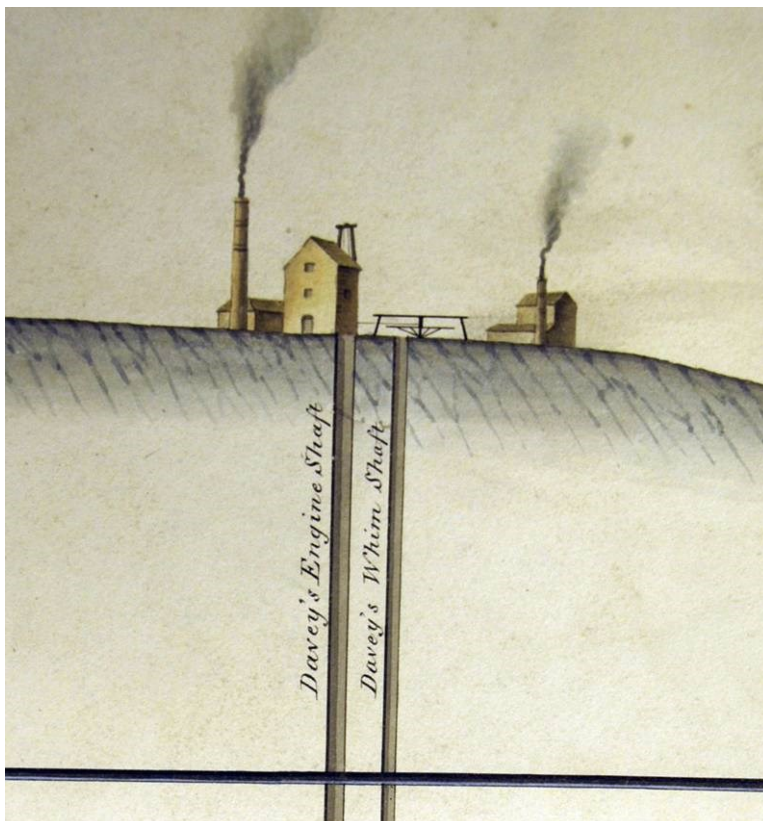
The pumping engine house, capstan and whim engine house on Davey's Shaft, as shown on an extract from CRO plan MRO103/17. © Cornwall Record Office.
